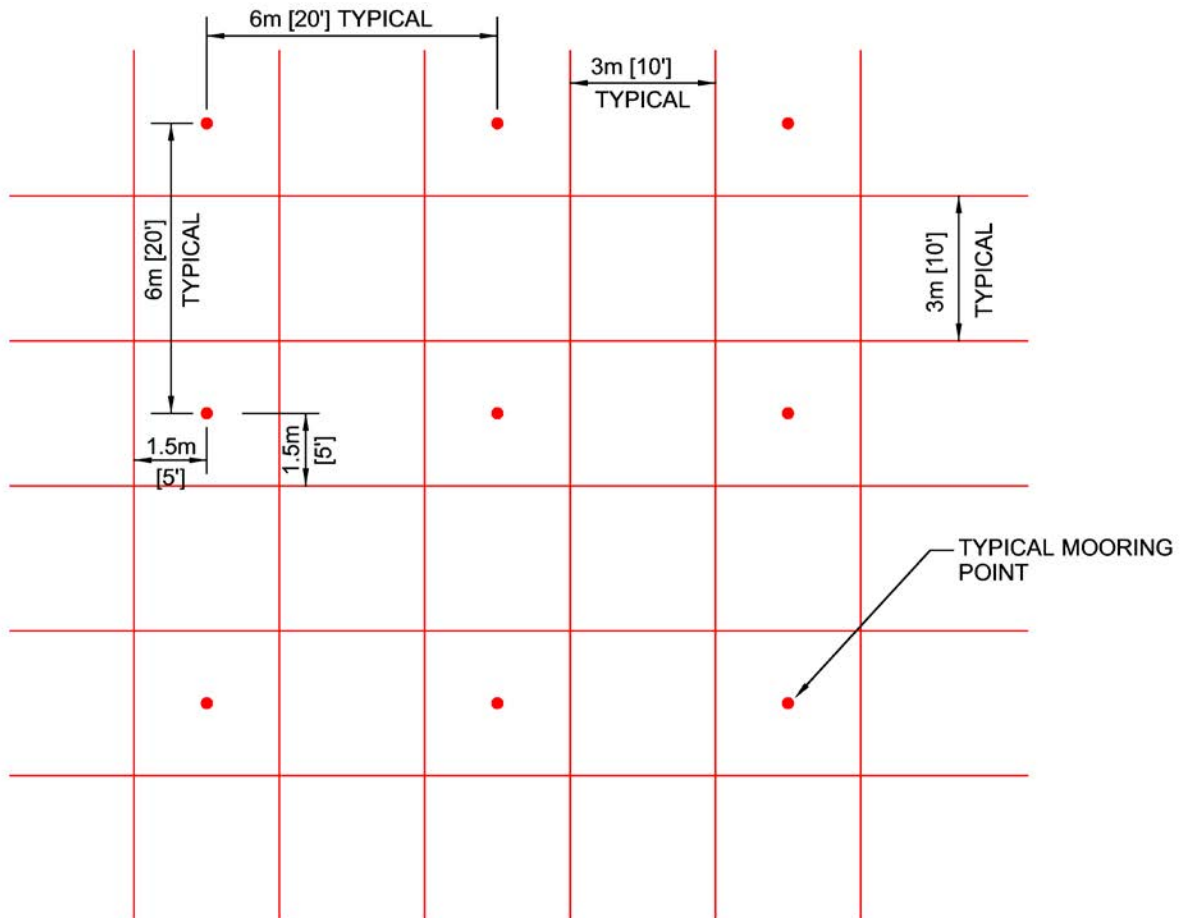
Army Rotary-Wing Allowable Mooring Point Spacing
